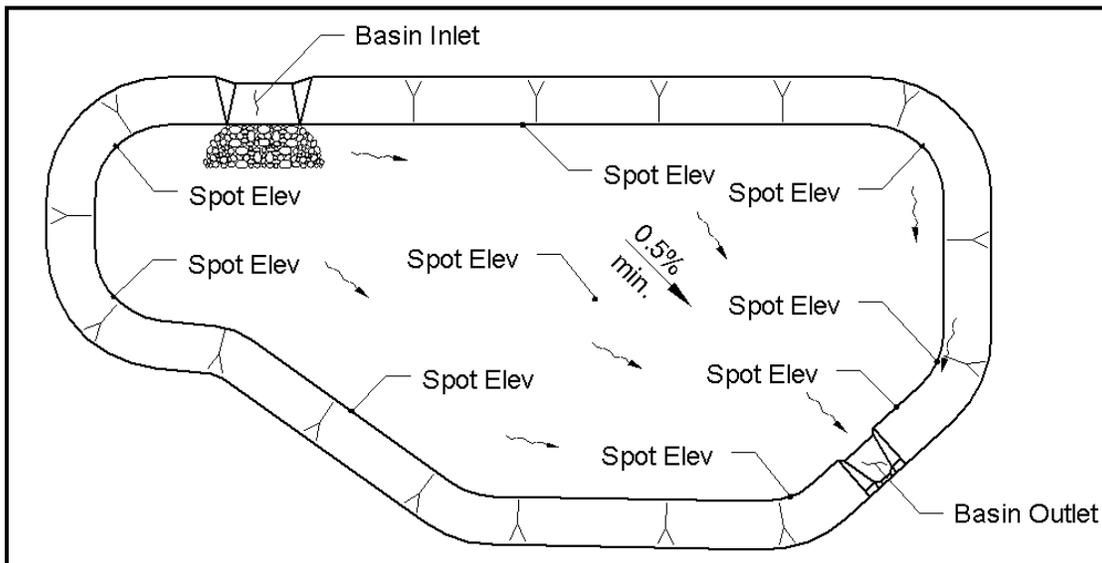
Basin Floor Minimum Slope for Positive Drainage
